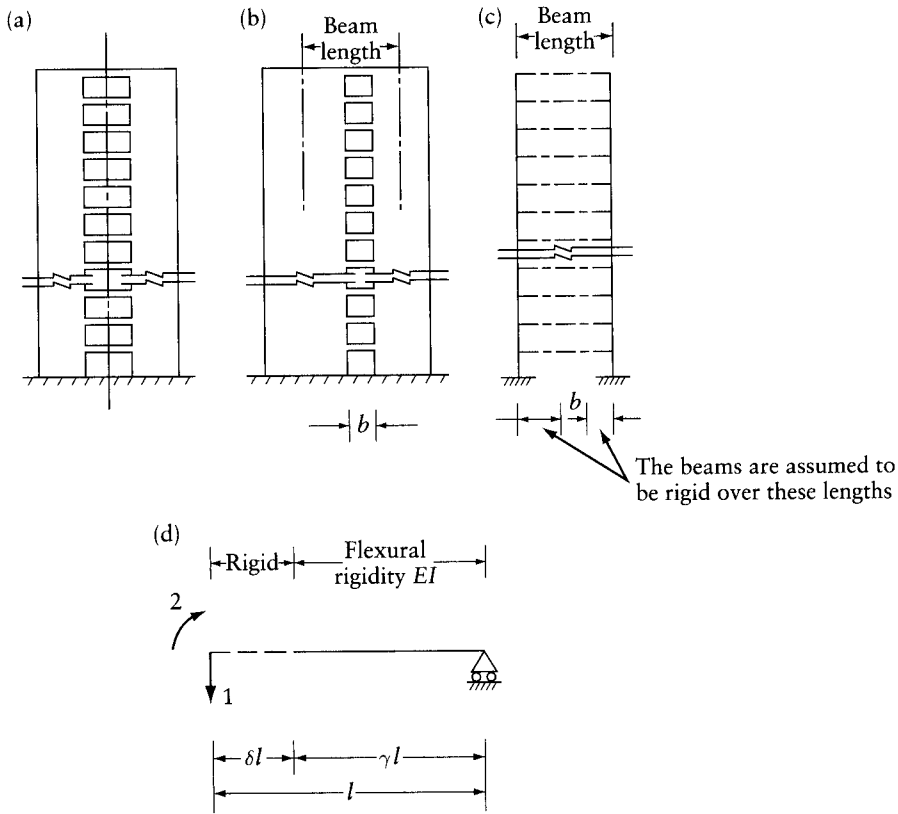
Idealized structure for the analysis of a wall with row of openings. (a) Symmetrical wall. (b) Wall with a row of openings. (c) Idealized structure for the analysis of the wall in part (b). (d) Coordinates corresponding to the stiffness matrix \bar{S} given by Eq. 14.29.
